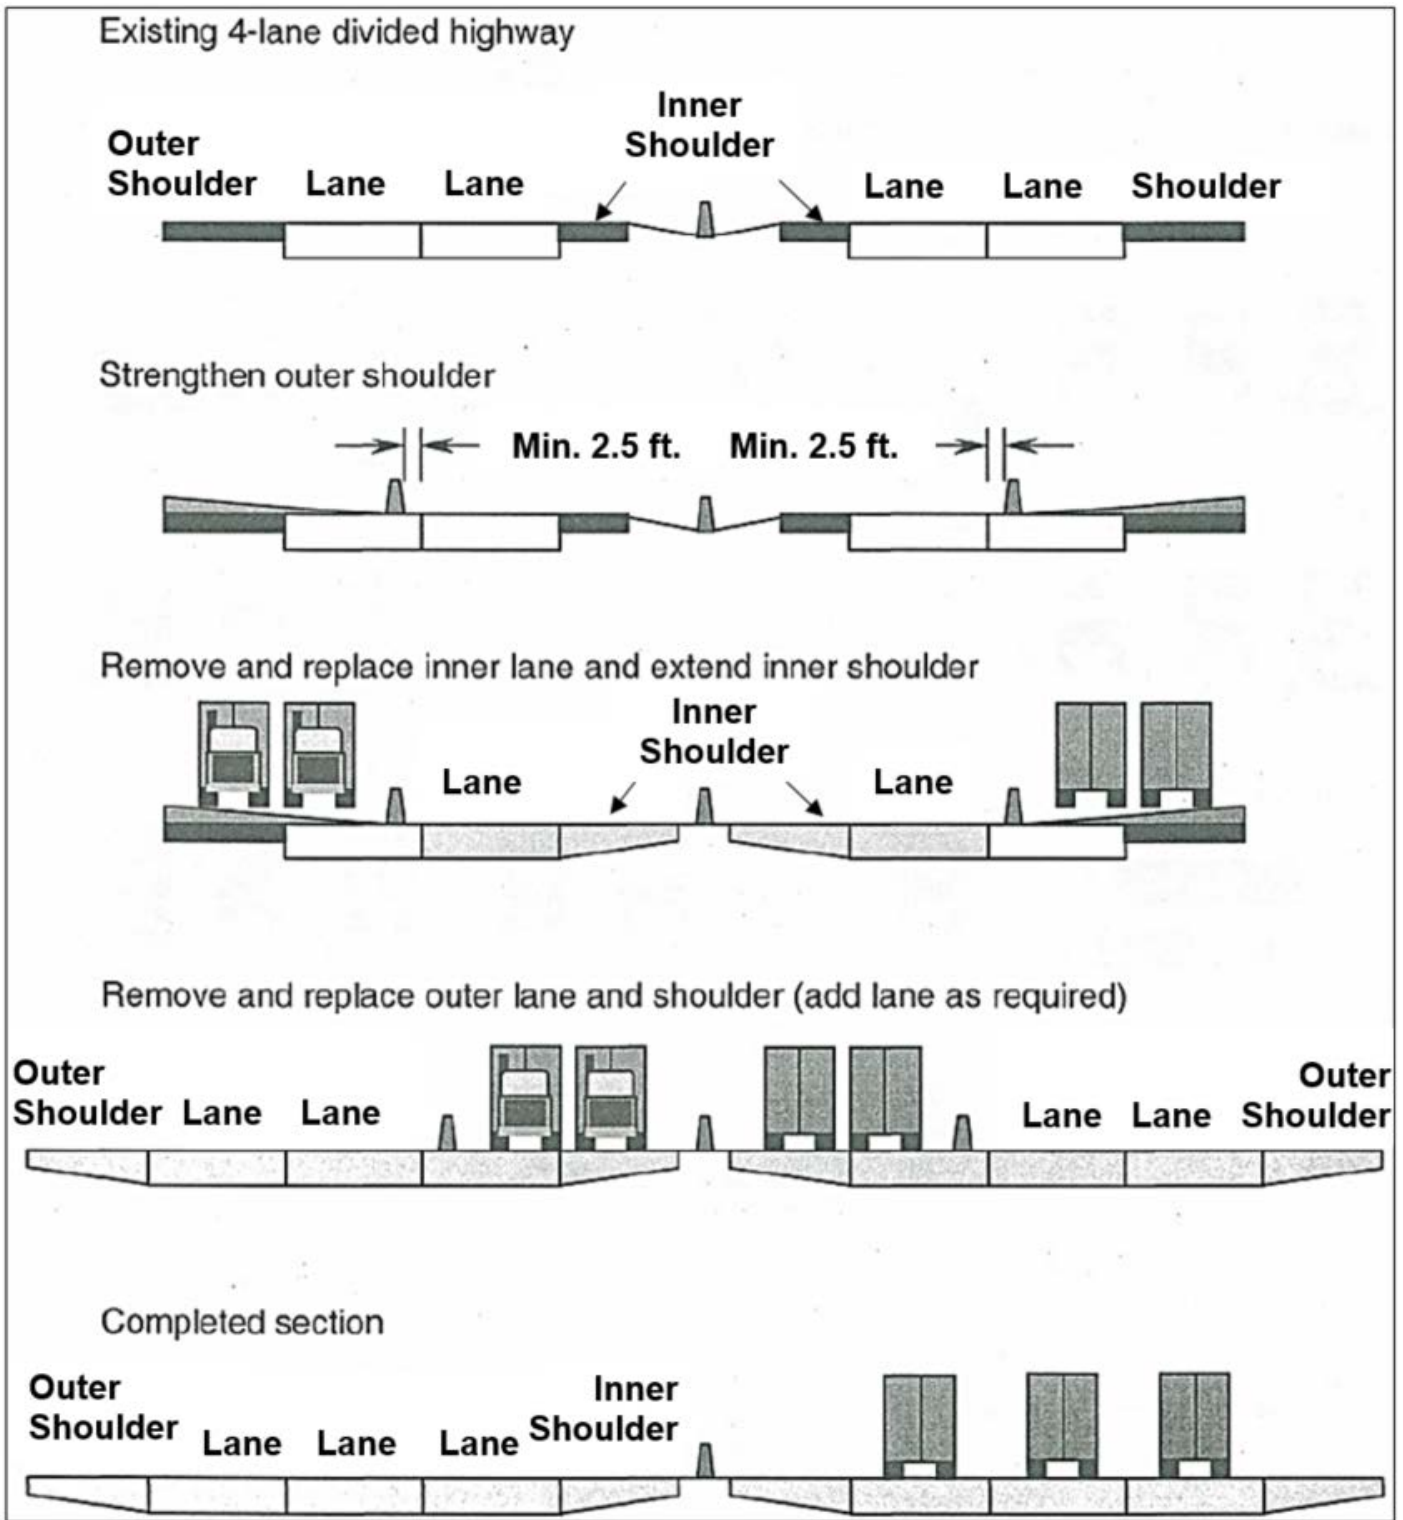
Concrete overlay of four-lane divided roadway with paved shoulders (Harrington and Fick 2014).
